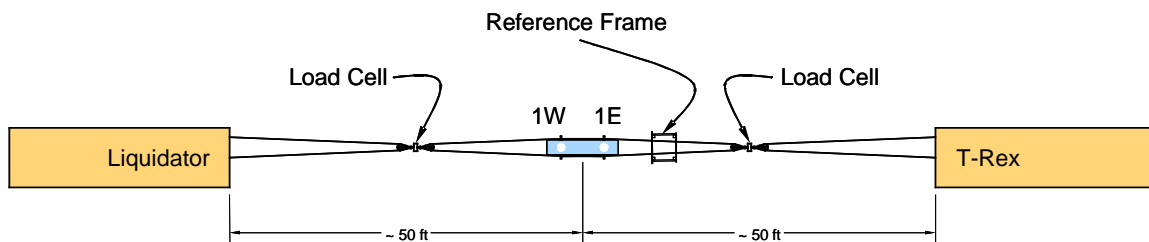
Plan view of two NEES shakers applying loads to scaled bridge bent (credit: S.L Wood).
